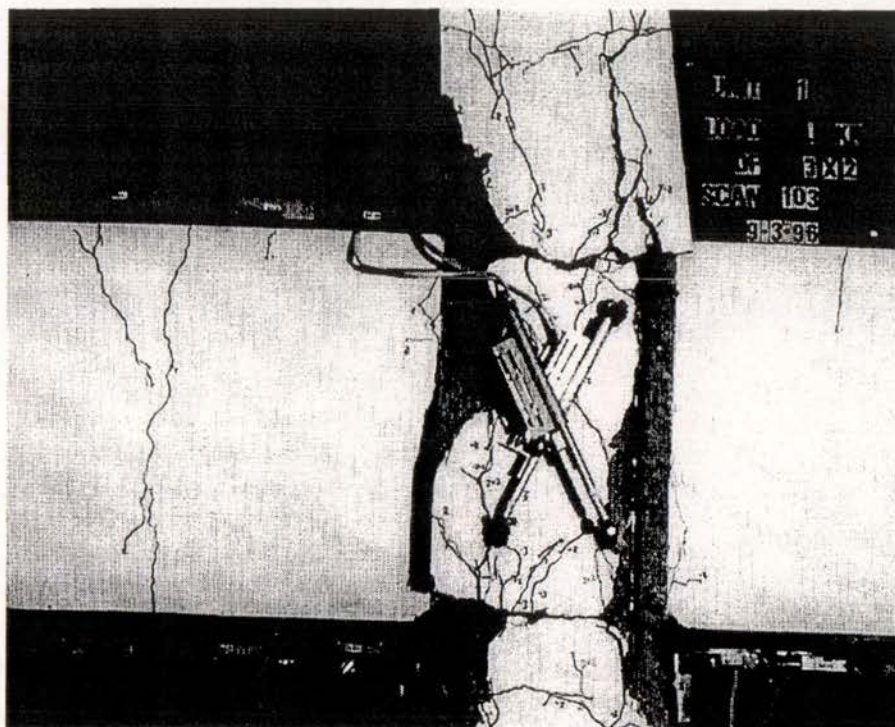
Final Appearance of As-Built Interior Beam-Column Joint Unit 1
